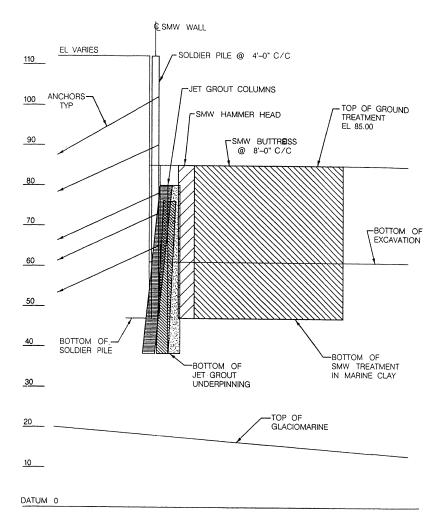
West Wall "Floating" SMW Buttress and Location of Jet Grouting (Reference 17)
